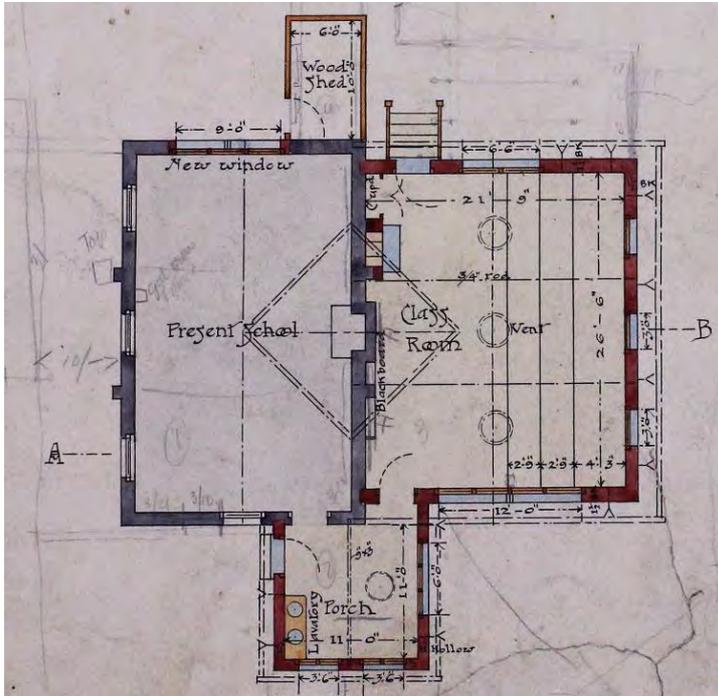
Floor plan drawn for the 1907 addition. (Source: PROV VPRS3686/P7/958)
